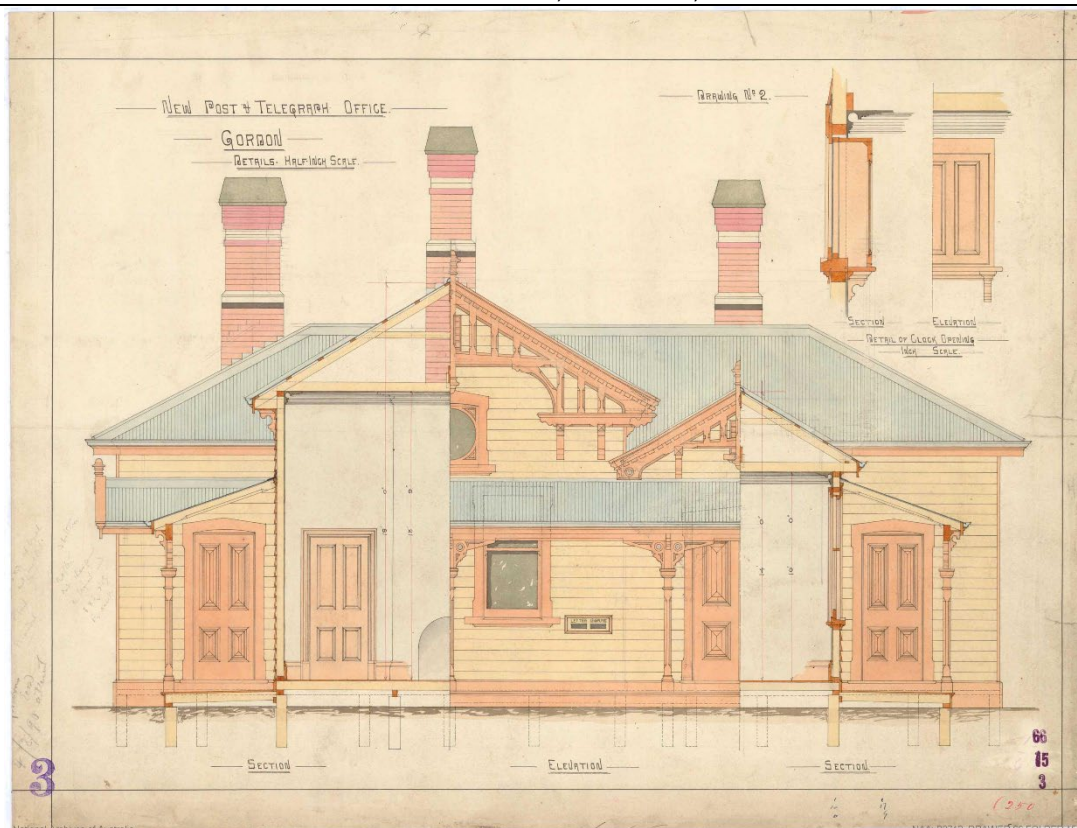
Victorian Public Works Department, Proposed Gordon Post & Telegraph Office, Section, Elevation & Detail drawings, 23 May 1890.
